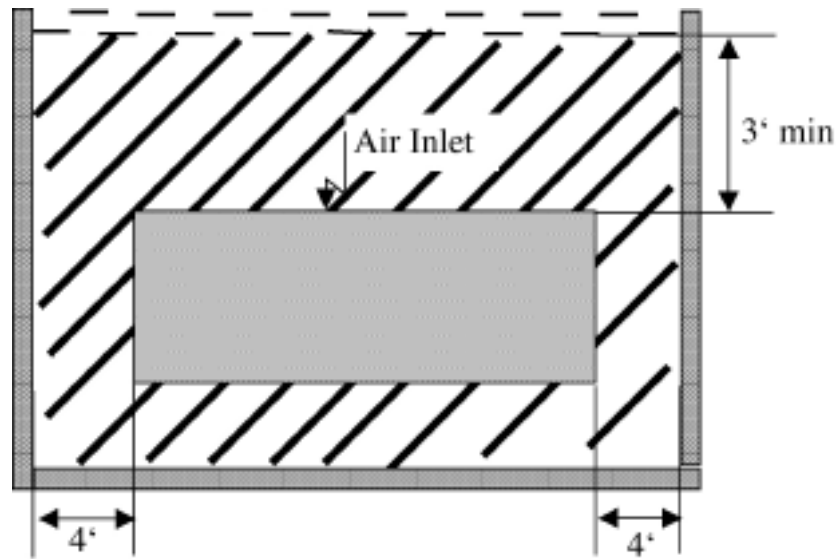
Plan view of unit enclosure with louvered wall & closed top installation
